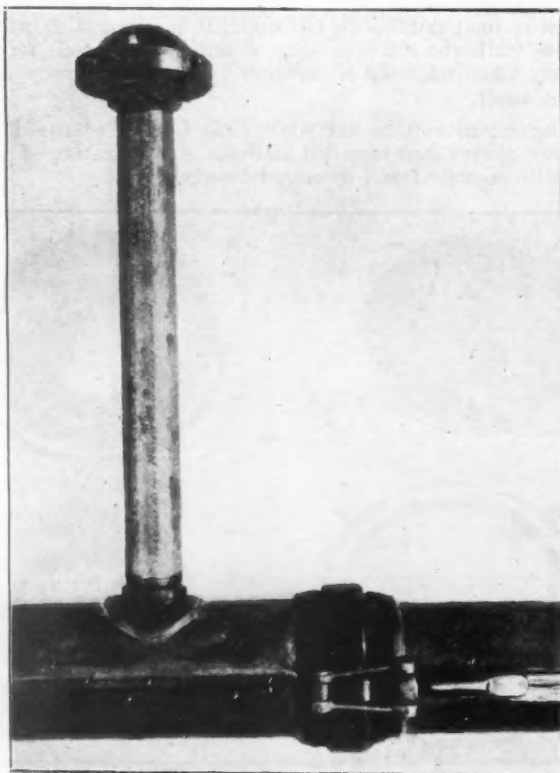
Showing the assembled spray and short standpipe attached to clip-jointed fluming.
